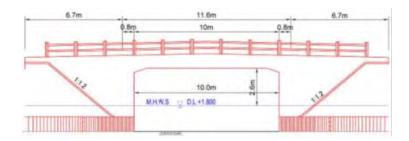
Navigational Clearance under Causeway Bridge
